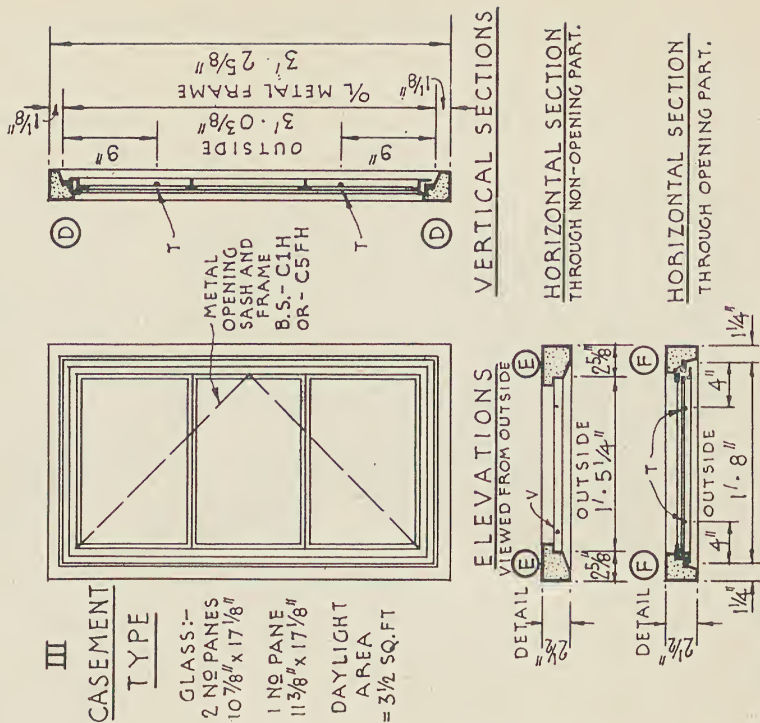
PRECAST CONCRETE WINDOW FRAMES.
